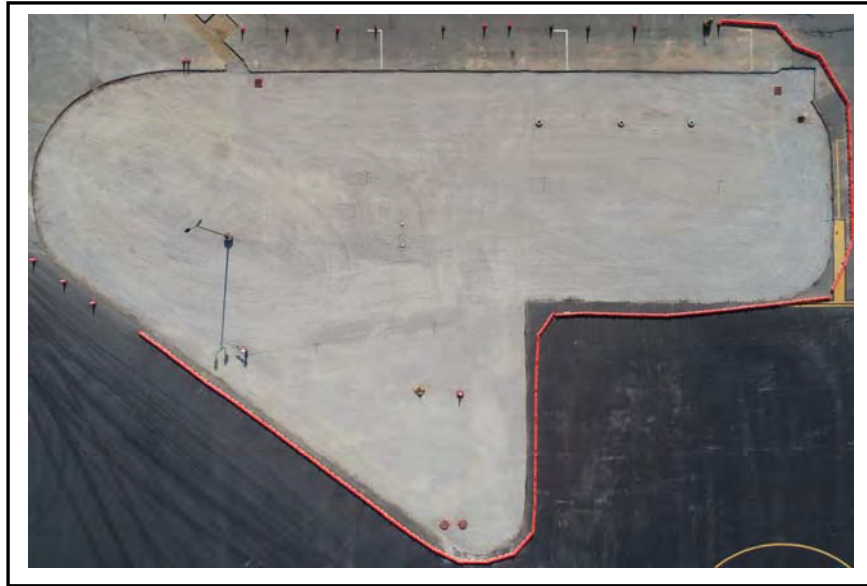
Final placement of subgrade material in ARFF Building Area in preparation of asphalt pavement placement.
